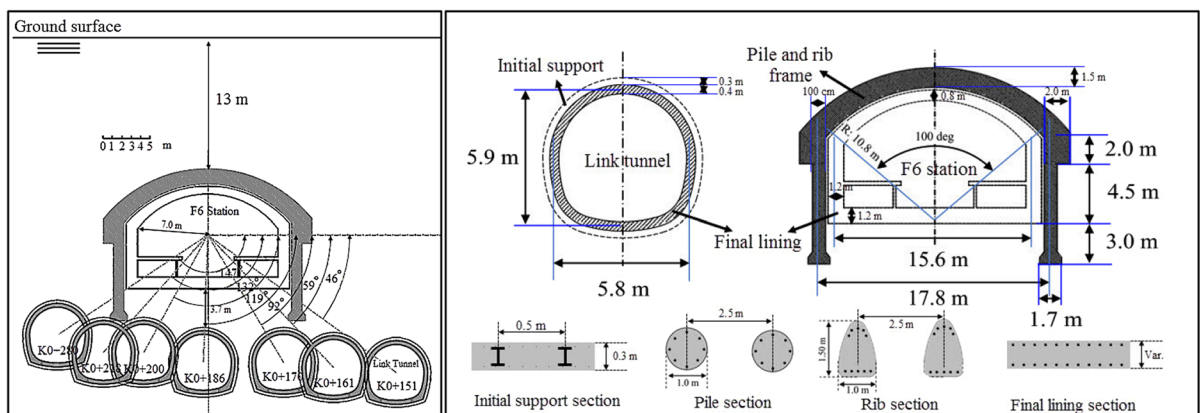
F6 station and link tunnel relative location together (left figure) and their dimension and cross section (right figure)
